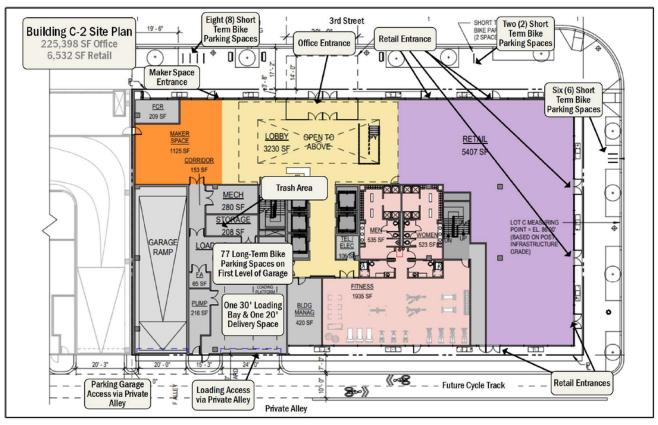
Site Plan (Source: CTR, Gorove/Slade, Figure 7, 3/9/20)
